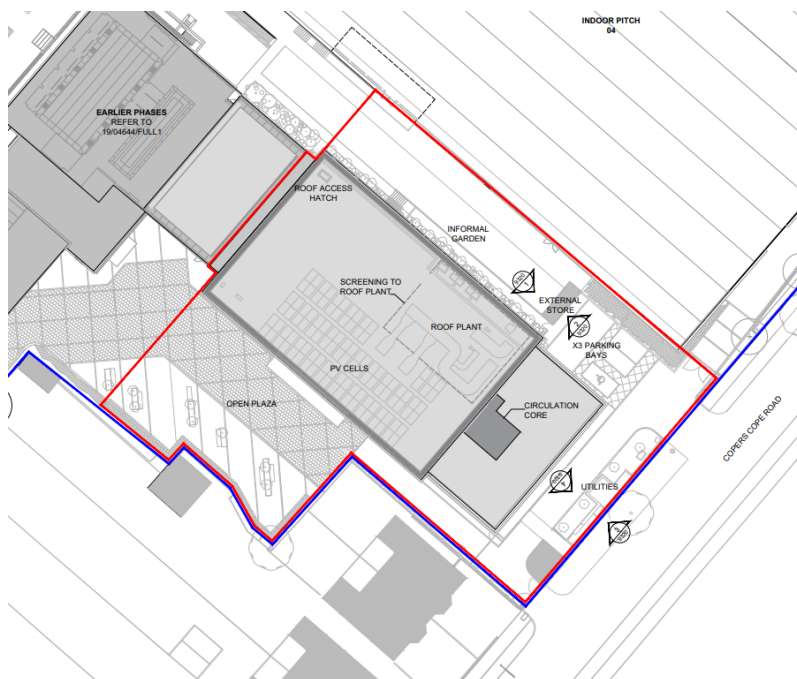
Proposed block plan (consistent with 19/04644/FULL1)
